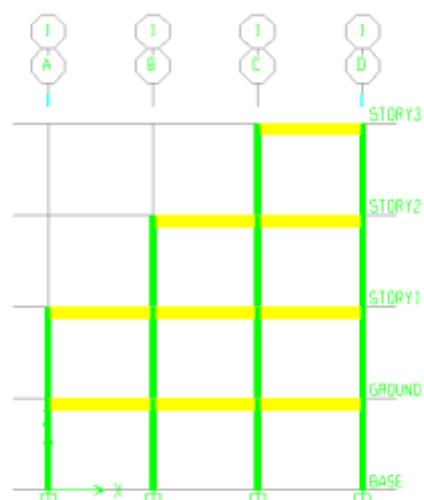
Elevation of setback building for three storey model (00 slopes)
